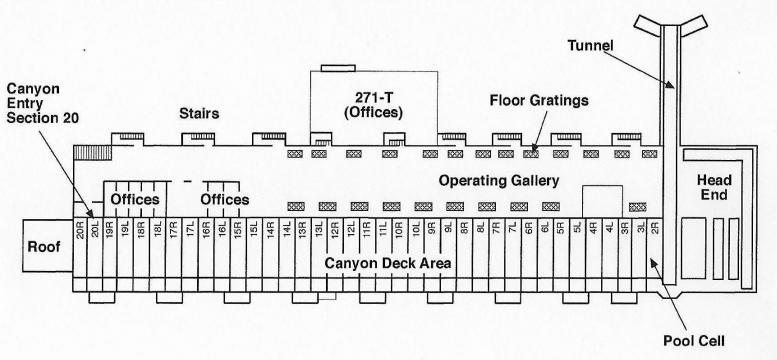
271-T Building and 221-T Building Second Floor Cell Layout.
